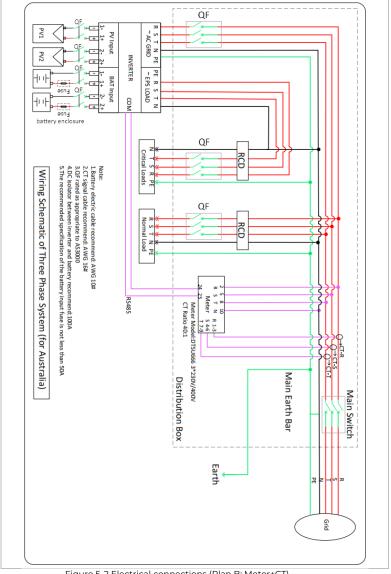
Electrical connections (Plan B: Meter+CT)
